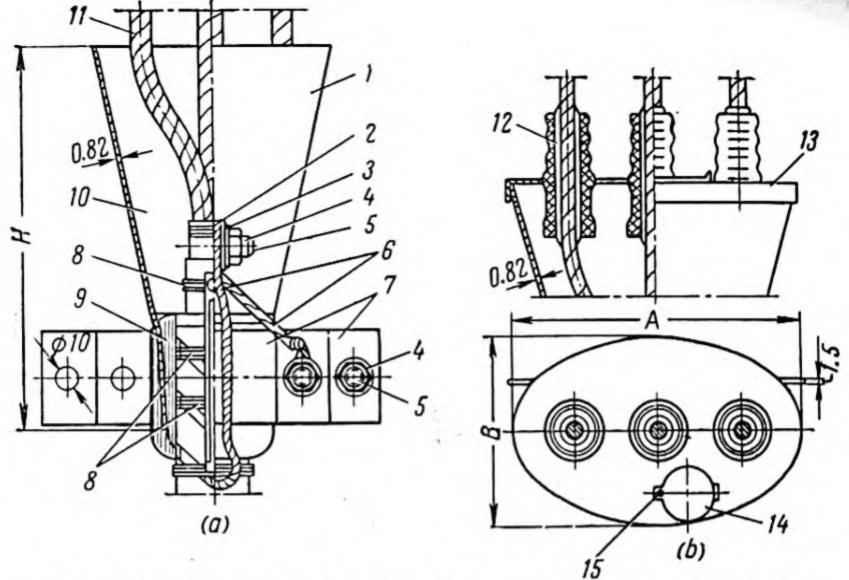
Cable end sealing in sheet-metal oval-shaped end bell:
